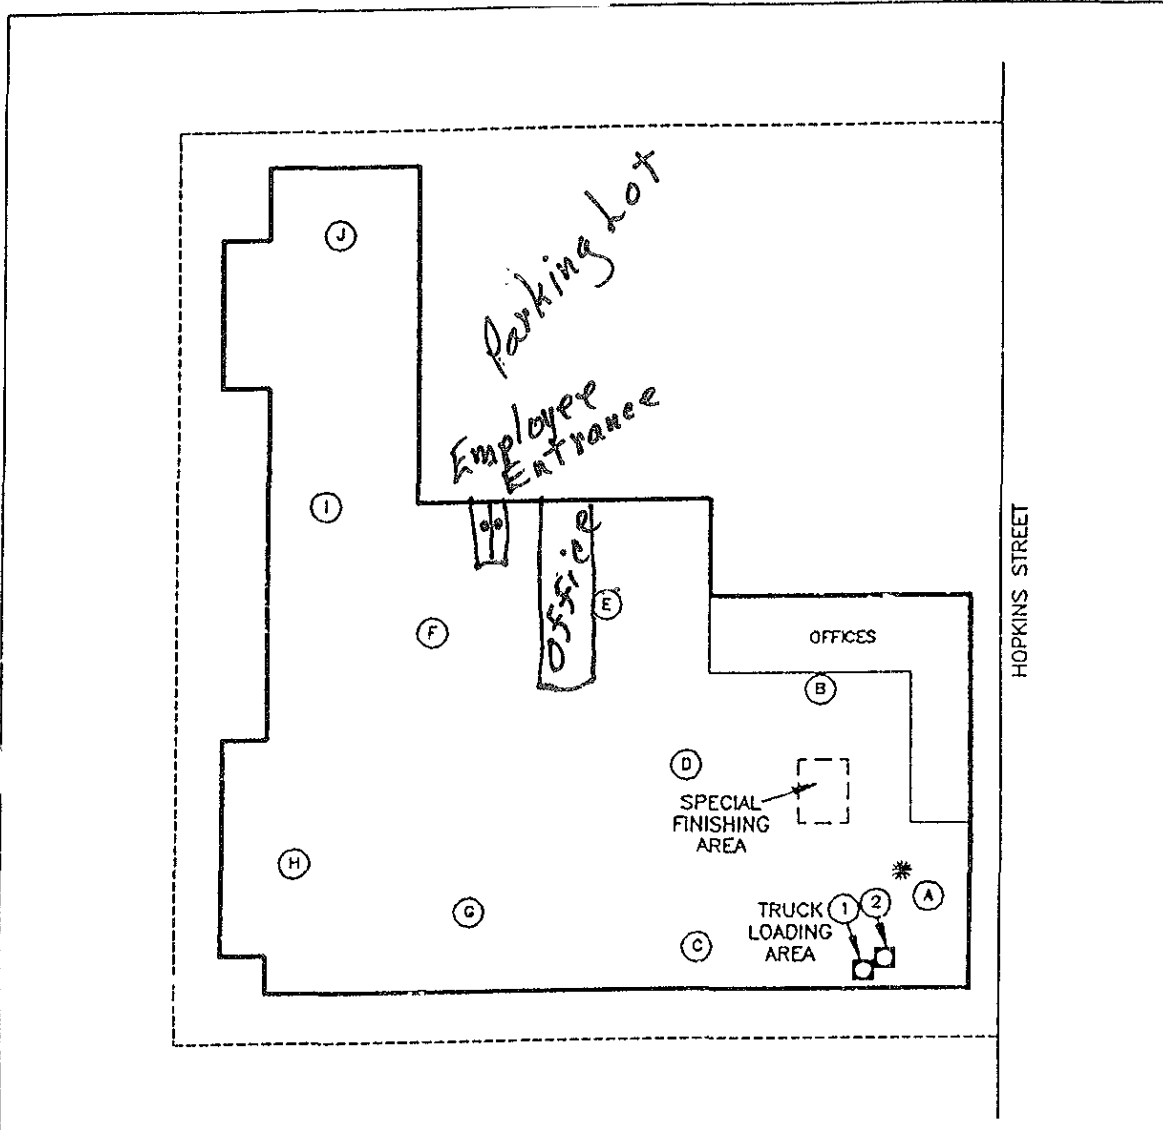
Plot Plan of Former Bliss and Loughlin Steel Company Facility
